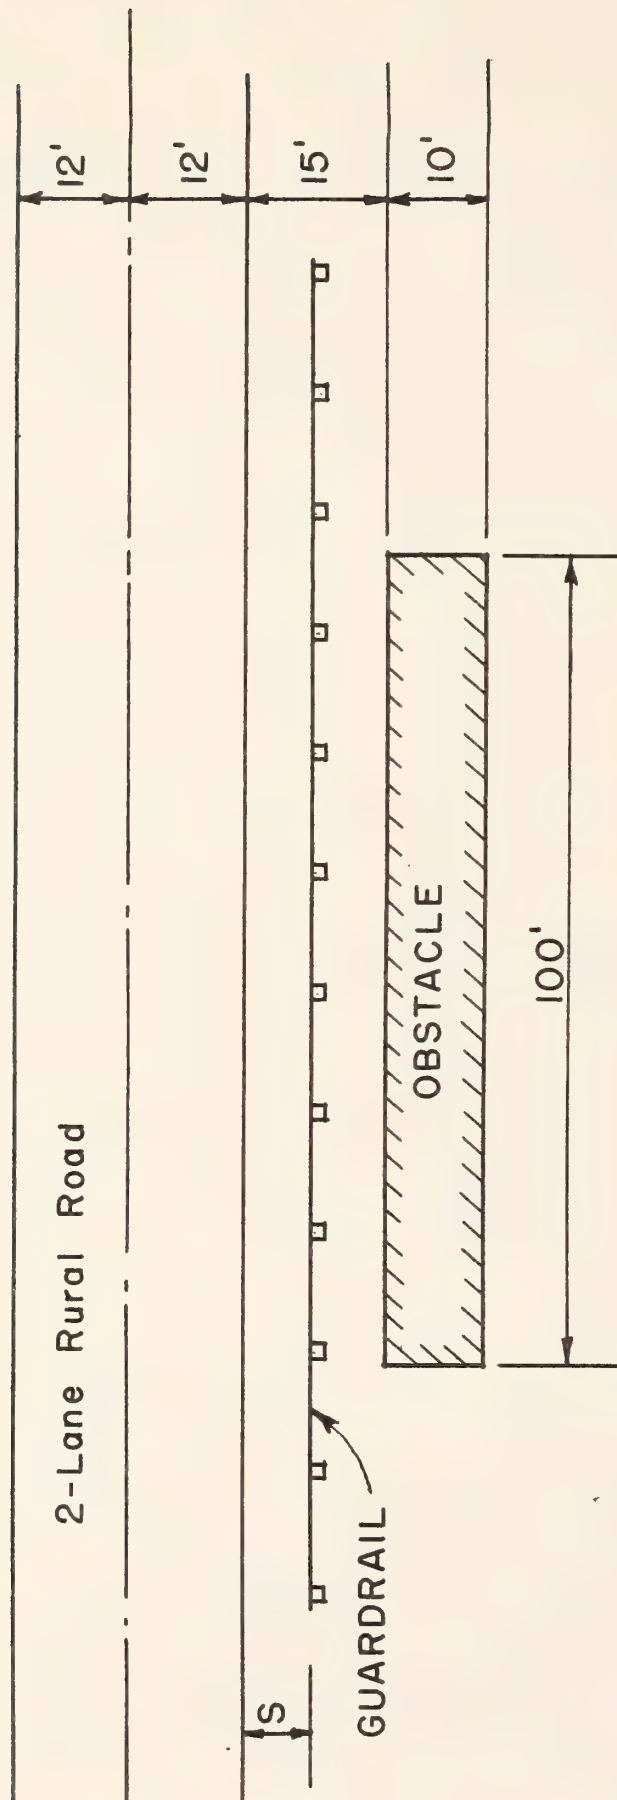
SAMPLE GUARDRAIL PLACEMENT CASE
